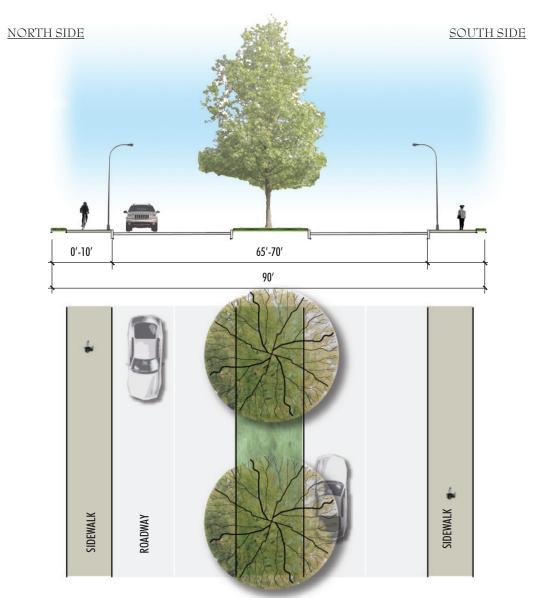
The Hub: Zone 7 Existing Conditions Section and Plan
